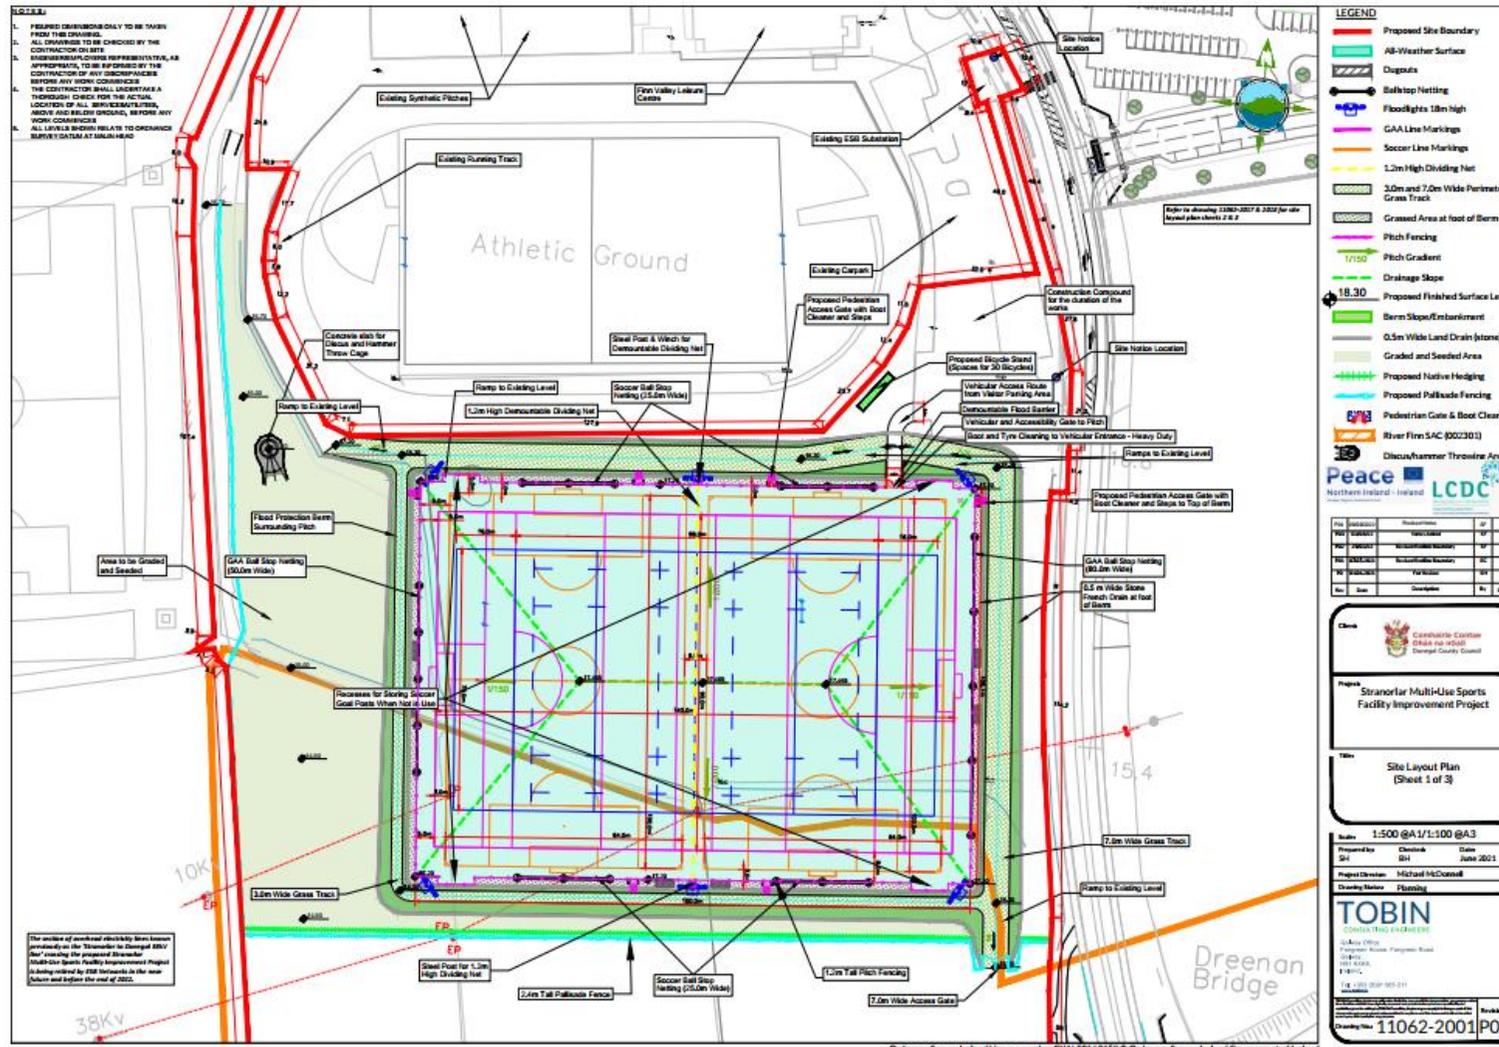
Stranorlar Multi-Use Sports Facility Improvement Project - Site Layout Plan
